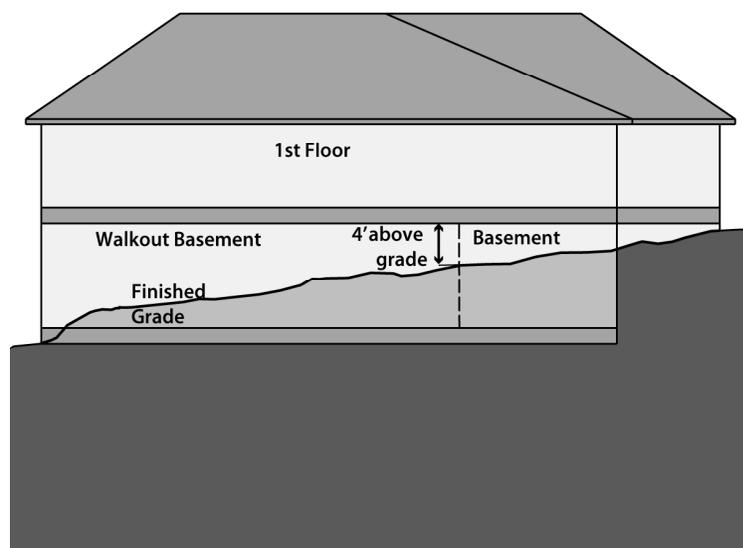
Measurement of basement and walkout basement areas – *Side Elevation View
